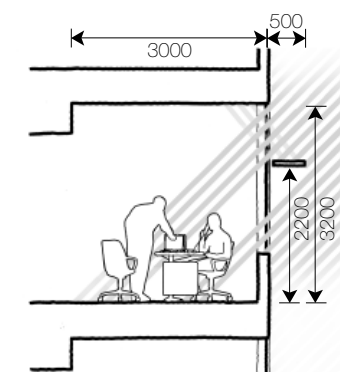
Type 5 Curtain wall with shading shelf and raised ceiling
